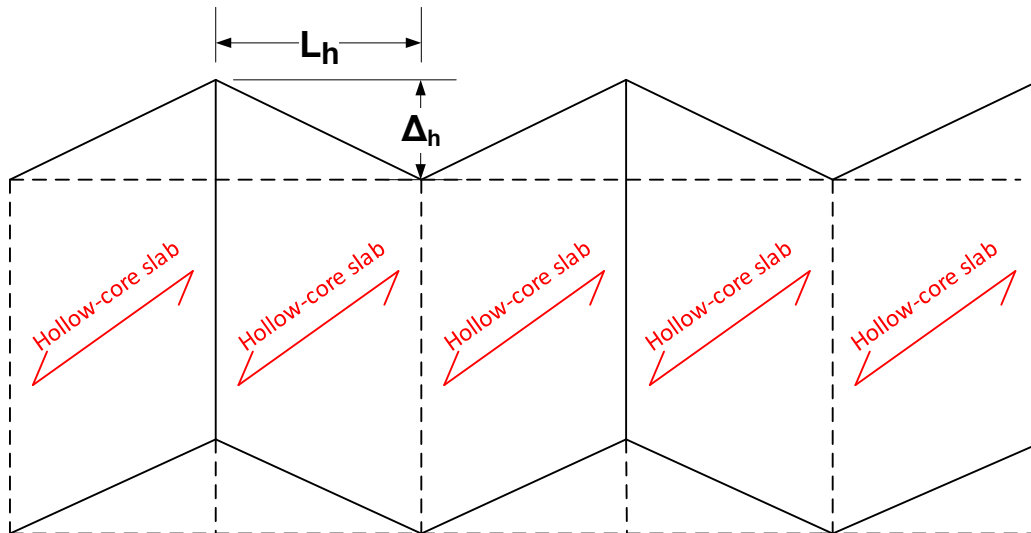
In-plane shear deformations in the hollow-core slab diaphragms and the diaphragm-to-truss connections.
